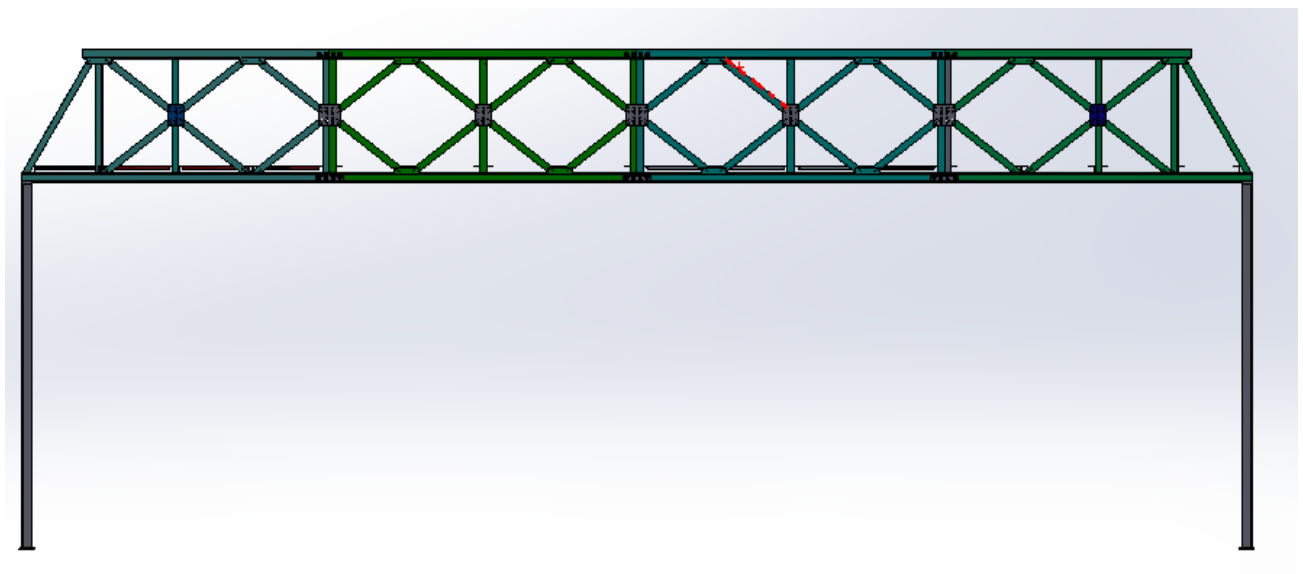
Front view of assembled steel truss pedestrian bridge
